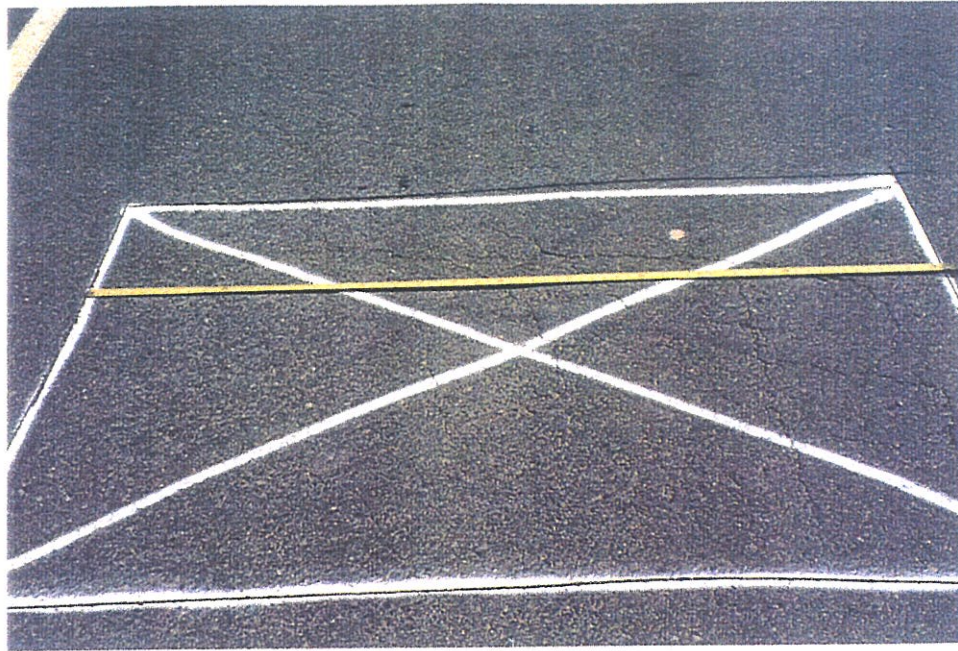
Fatigue cracking in pavement surface, test pit 1a.
